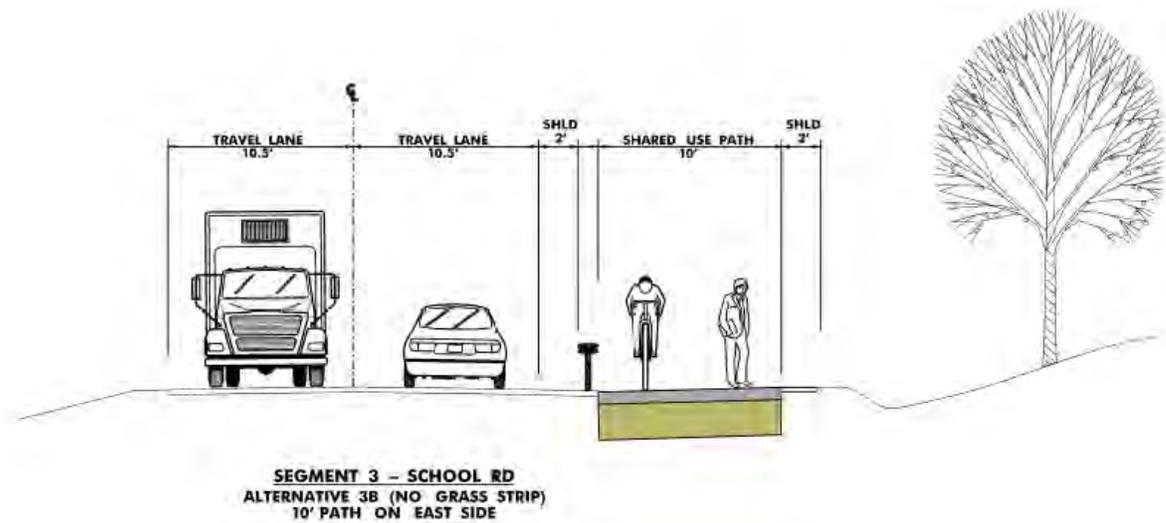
Typical section for 10' asphalt path immediately adjacent to School Road
